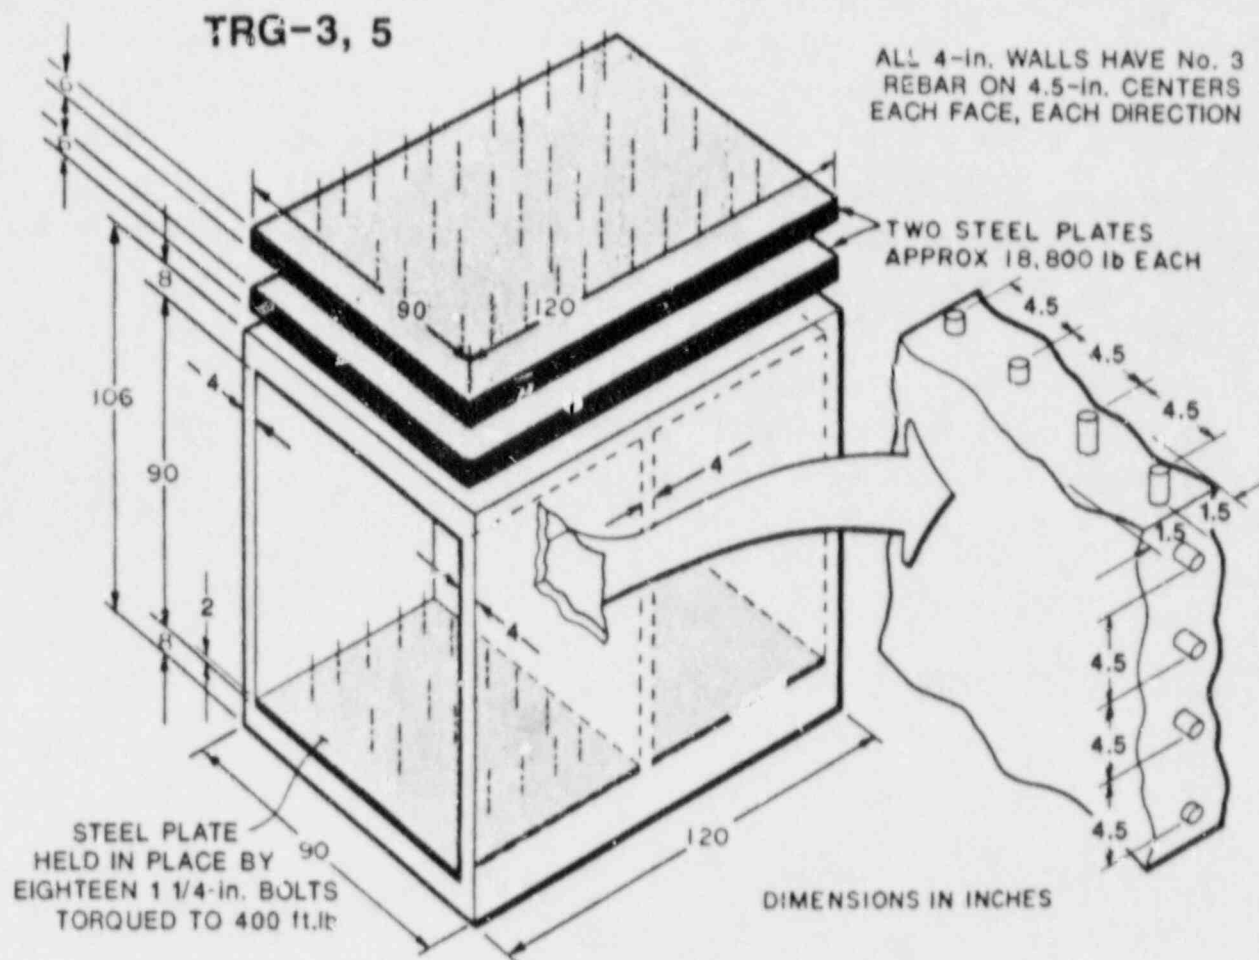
Four-inch-thick wall TRG type structure, TRG-3, 5.
